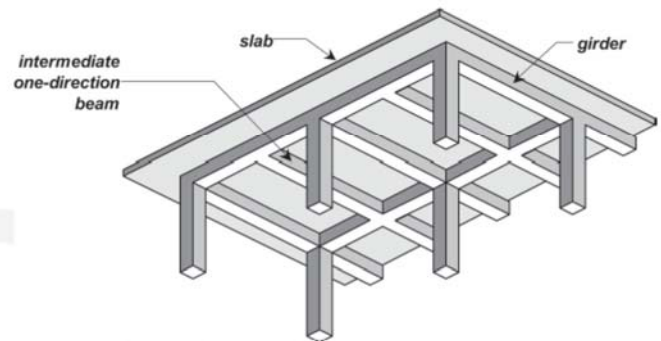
Use of one-direction intermediate beams in the slab-on-girder floor system.
